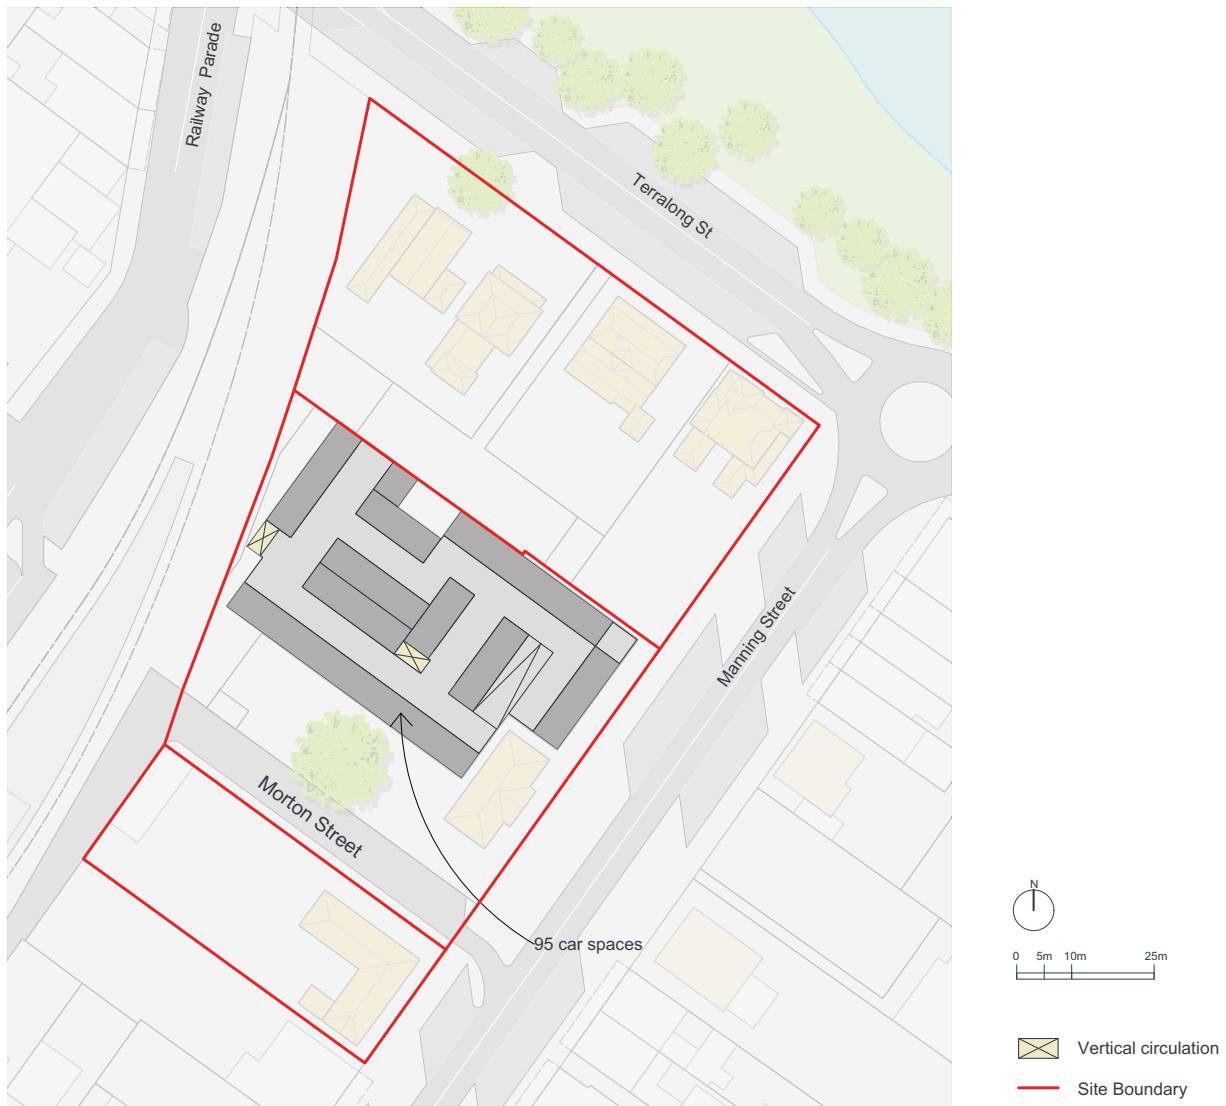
Civic Precinct - Site Layout Plan Basements 1 and 2
